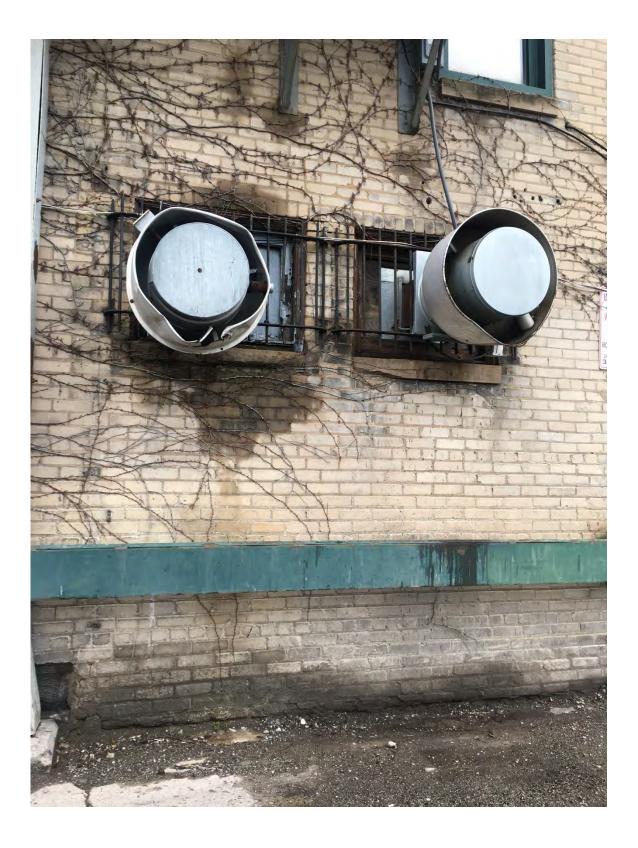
Exterior, North Façade, Looking South. 6/17/2019
